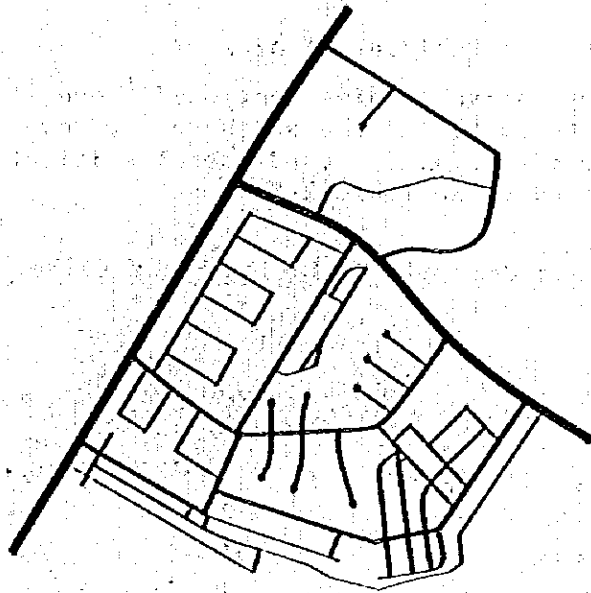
Road Pattern Alternative 2 Na Klua Town B
